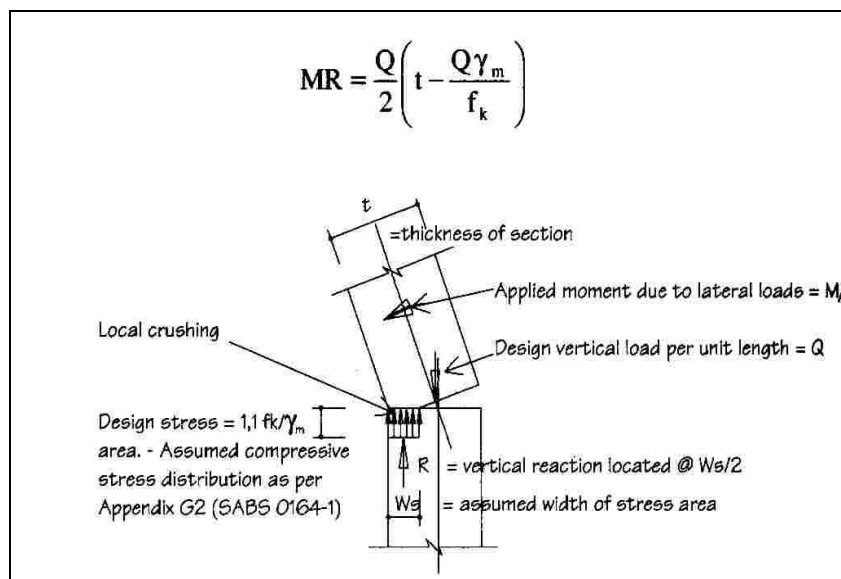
Cracked Section Stress Block (Crofts & Lane, 2000:154)
